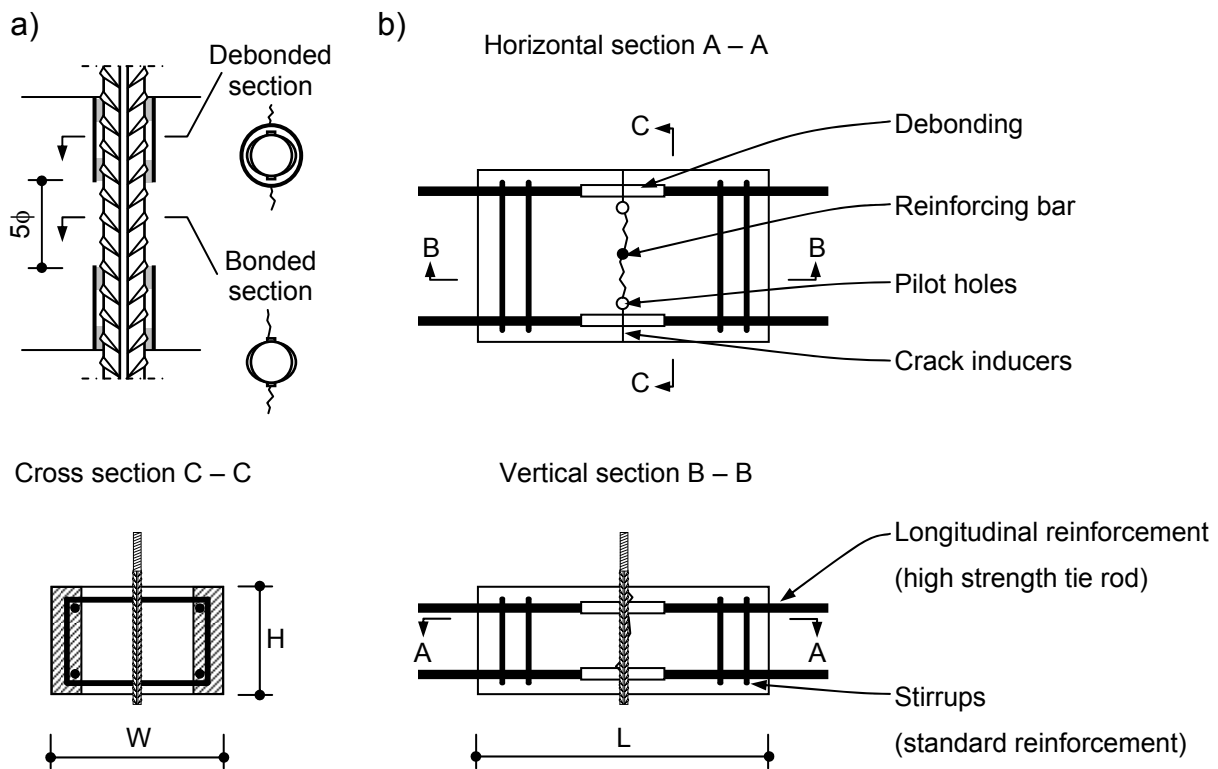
Layout of test specimen: a) Detail of reinforcing bar; b) Geometry and reinforcement (after Mahrenholtz, C.; Eligehausen, R.; Hofmann, J. et al. (2011))
